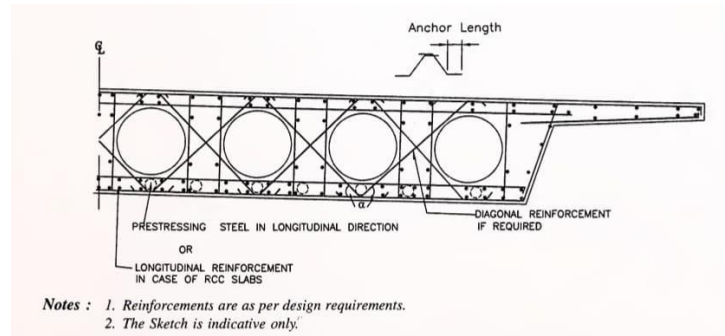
Voided slab with reinforcement details as per IRC : 18-2000.
